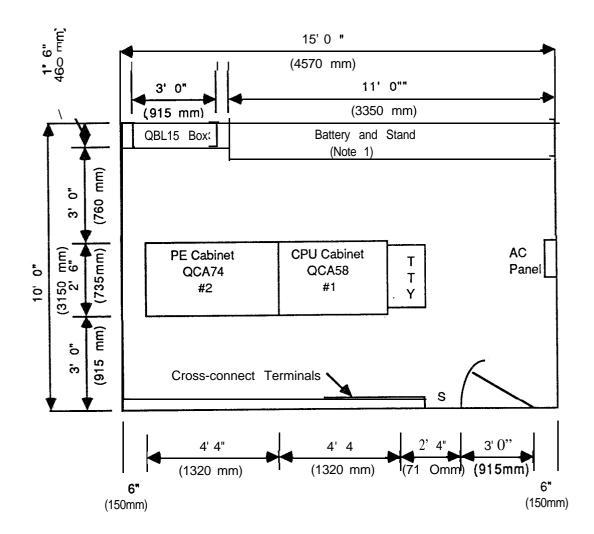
1: TYPICAL MERIDIAN SL- 1NT FLOOR PLAN
